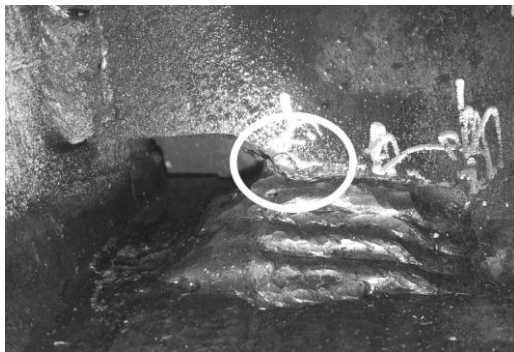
Fracture above the overlay welding around toe of scallop in the beam web (No.FL-s3)
